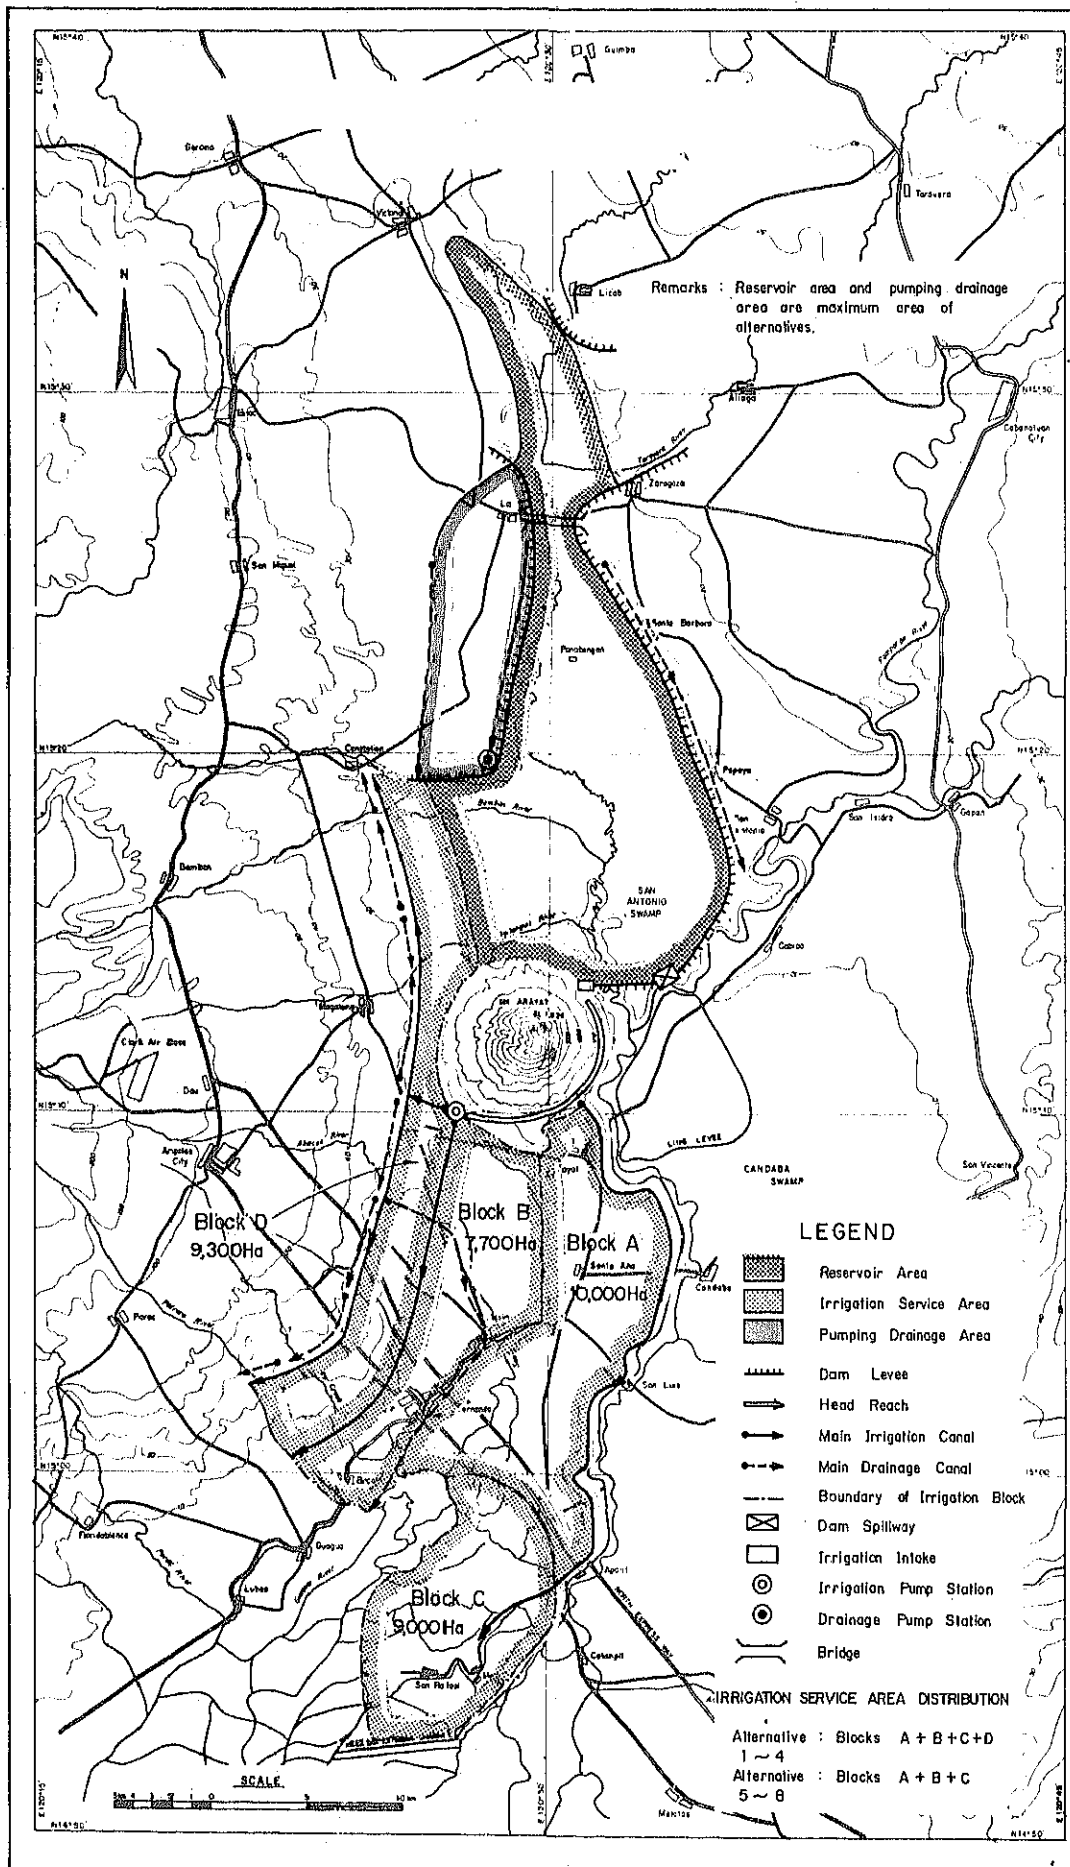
GENERAL LAYOUT OF IRRIGATION PLAN FOR ALTERNATIVE 9 to 3
